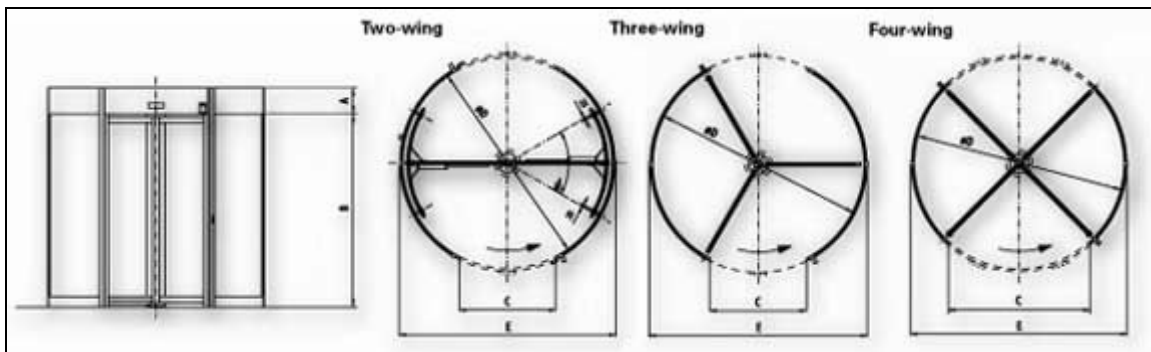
Elevation and plan views of 2-wing, 3-wing and 4-wing revolving doors
